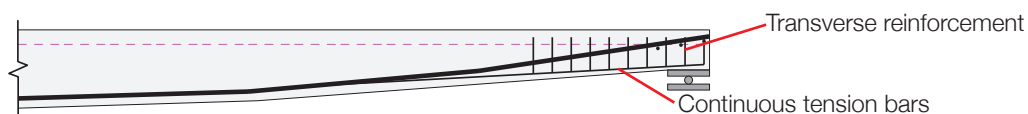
Proposed reinforcement layout for Beam 8\_3i.
